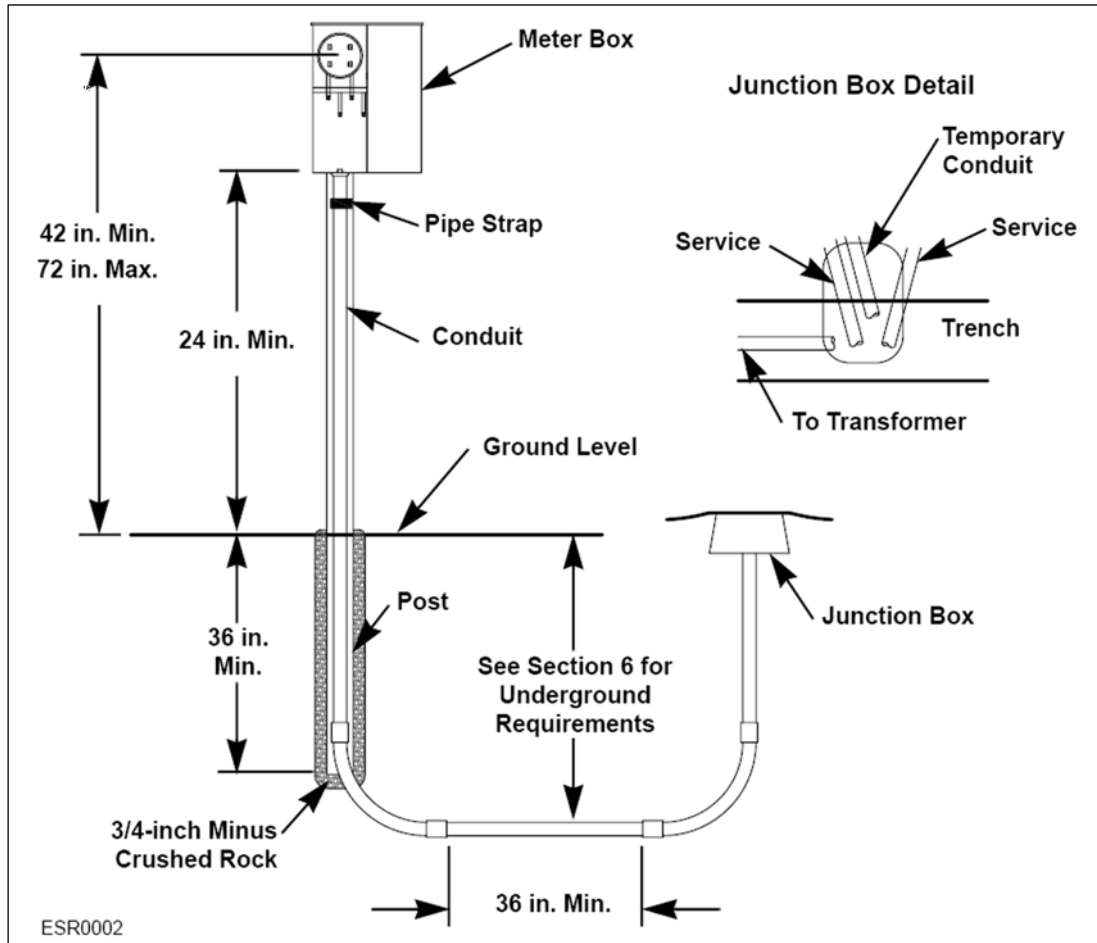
Underground Service Mounted on 6- x 6-inch Post
